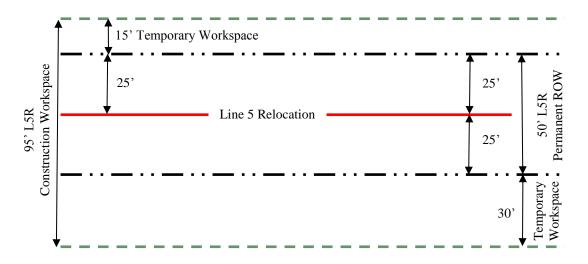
Typical Construction Workspace—Wetlands
